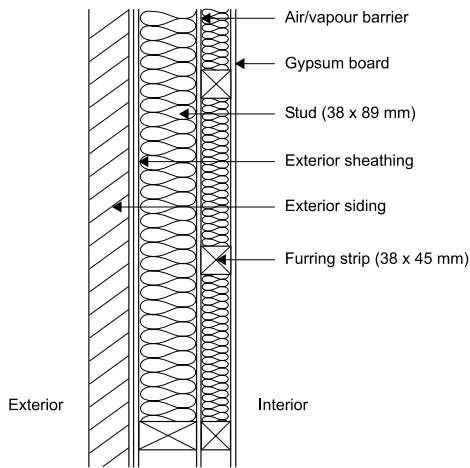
Vertical wall section showing air/vapour barrier placed between studs and interior furring
